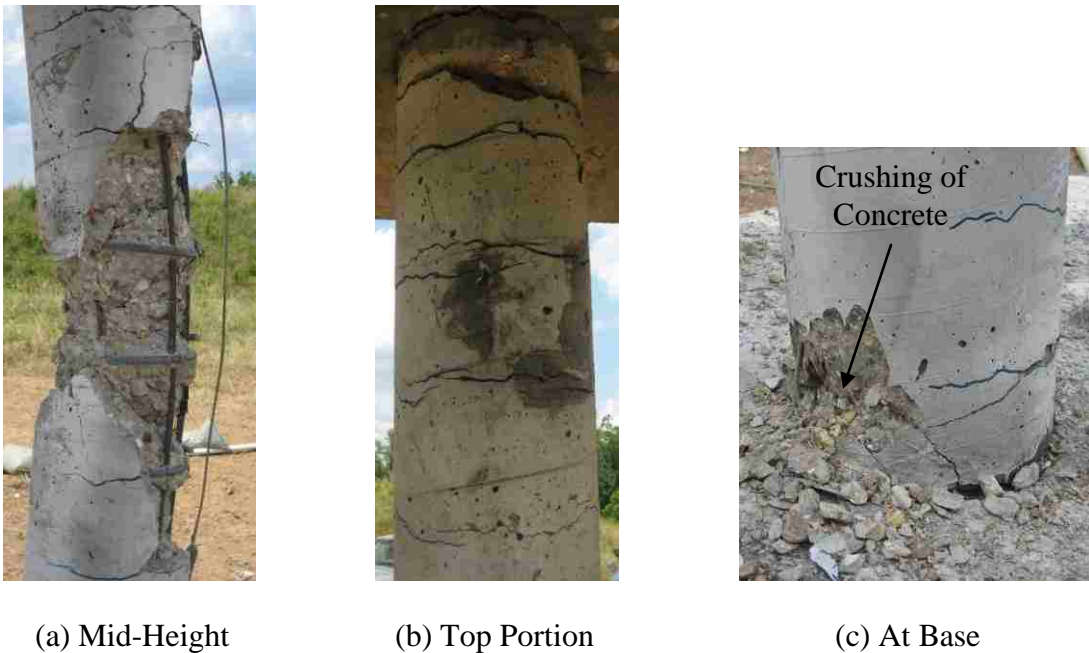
Damage to Column 1 after 30 lbs Blast
